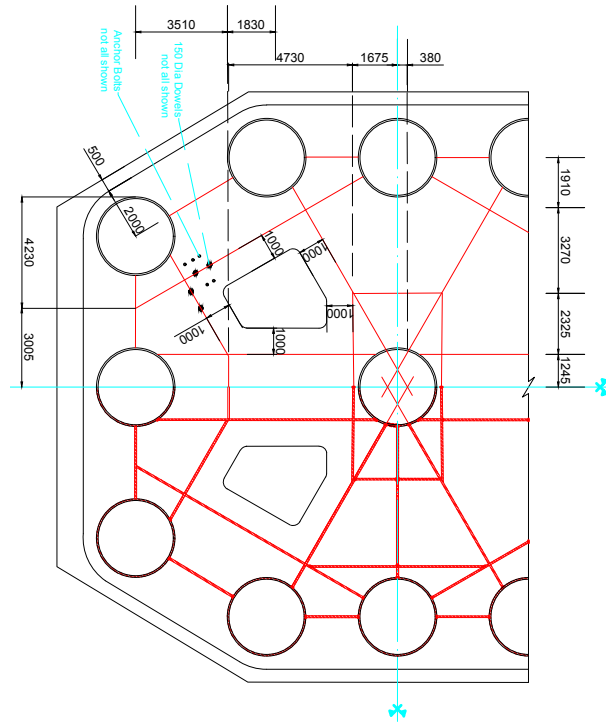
Plan view of pile cap for the Tower base with foundation piles and tower shafts [Ref.: AutoCAD made by the author].
